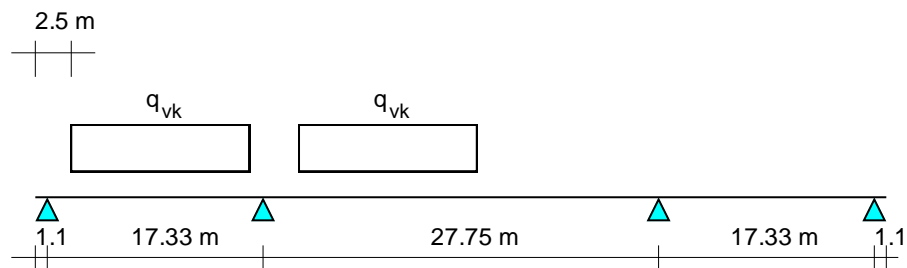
SW/0 arrangement for Load Step 6
